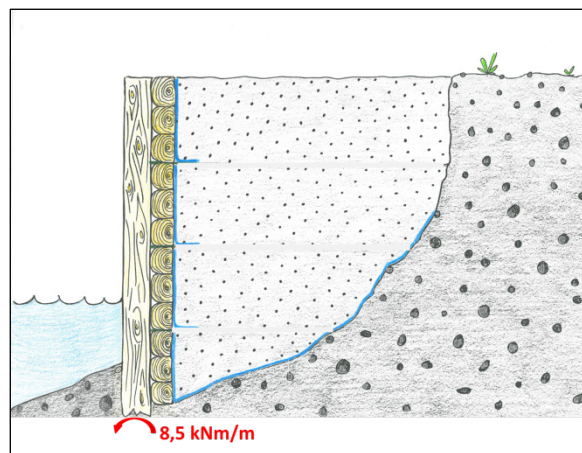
Cross section of a proposed method with wooden front without geosynthetic reinforcement.
